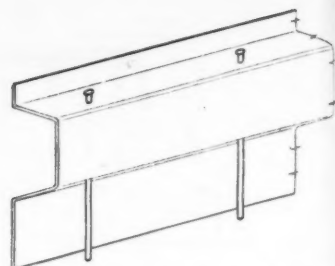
Detail of metal pressing for forming tongued and grooved joint.
